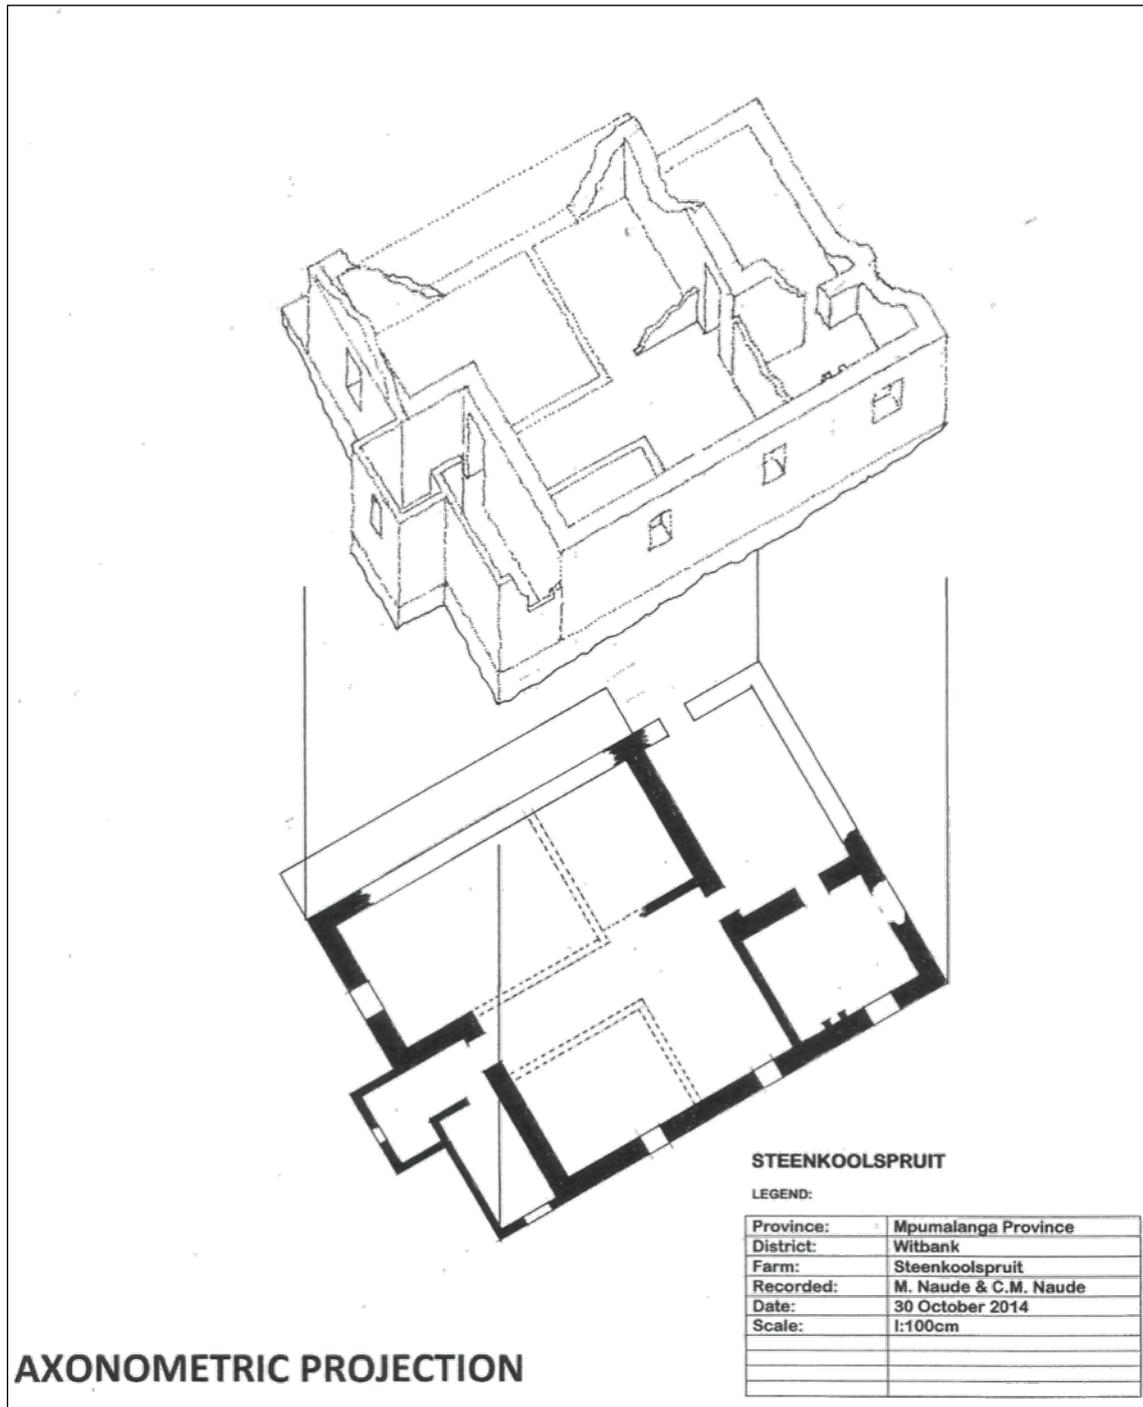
Axonometric view of the ruin indicating the floor plan layout and condition of the dwelling. Drawing appeared in the recording report of Mauritz Naudé (2014:3).
